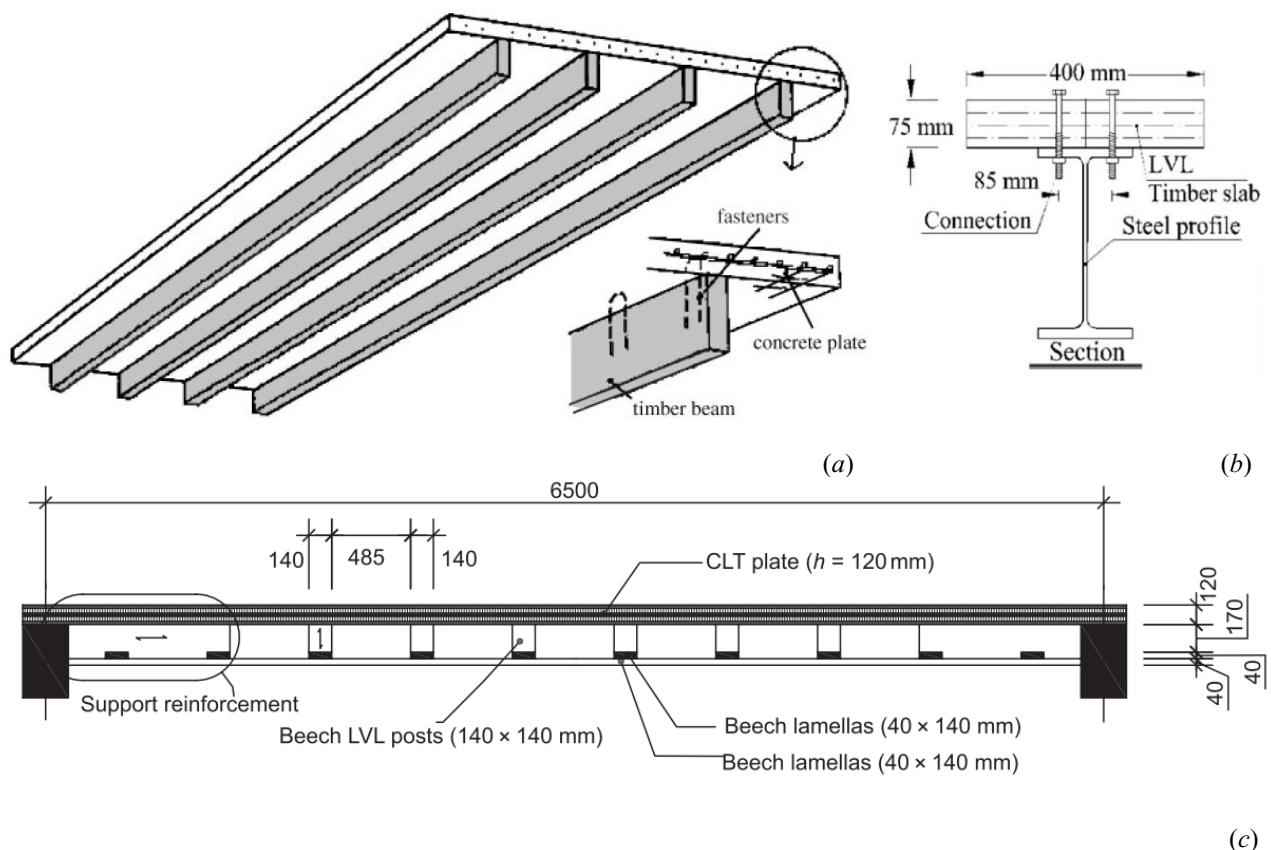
Examples of different types of timber-based composite structures TBCSs: (a) Timber-Concrete TCCSs, (b) Timber-Steel TSCSs and (c) Timber-Timber composite structures TTCs (*image credits: (a) Ceccotti [2], (b) Hassanieh et al. [3] and (c) Leyder et al. [4]*).
